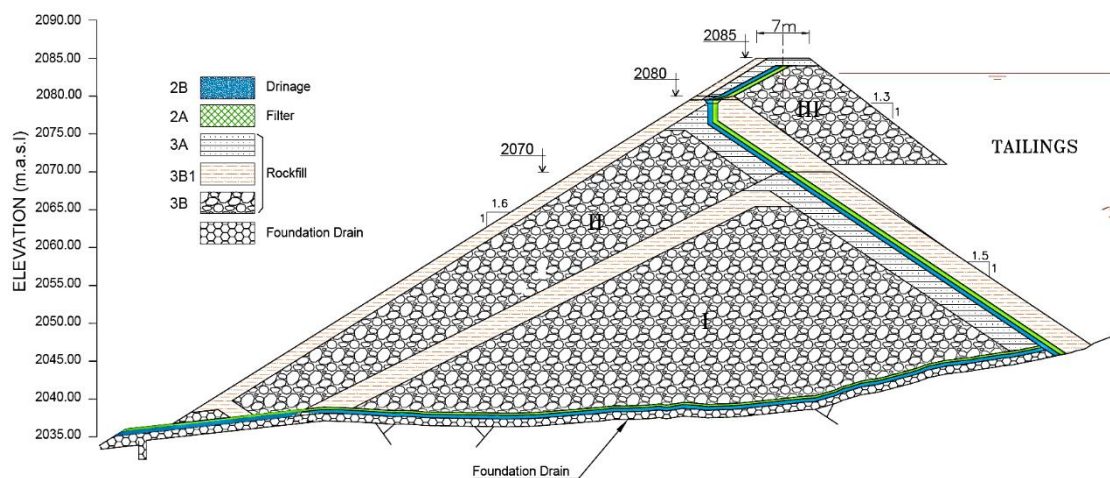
Typical cross-section and raised stages of Mazraeh copper mine tailing dam.
